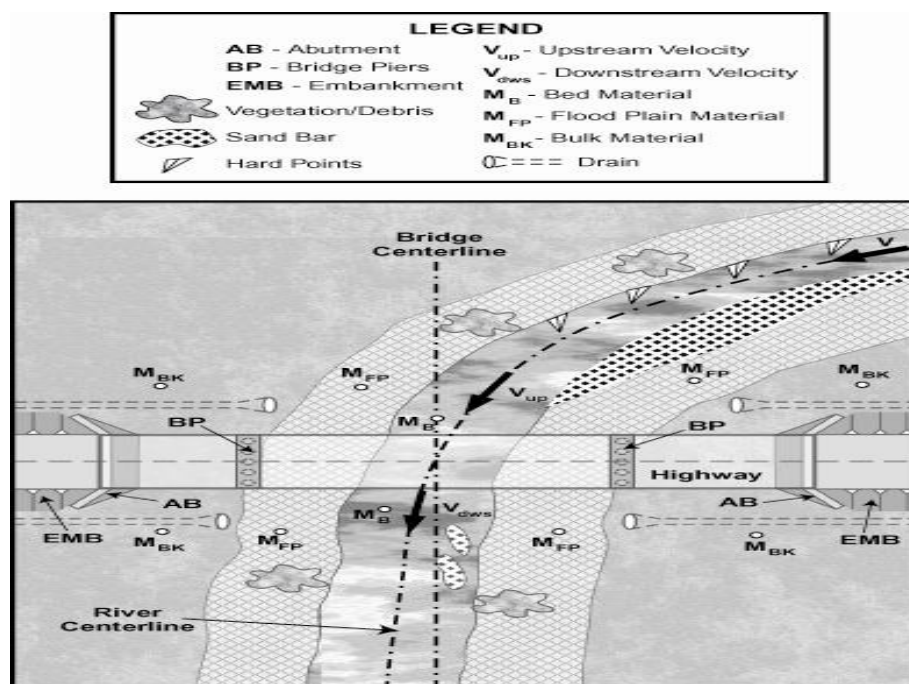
A sketch of a typical bridge waterway, where flow that passes through a bridge constriction is directed towards the bridge embankments. The different media based on which the bridge foundations are established are also presented (after Ettema et al., 2006).
